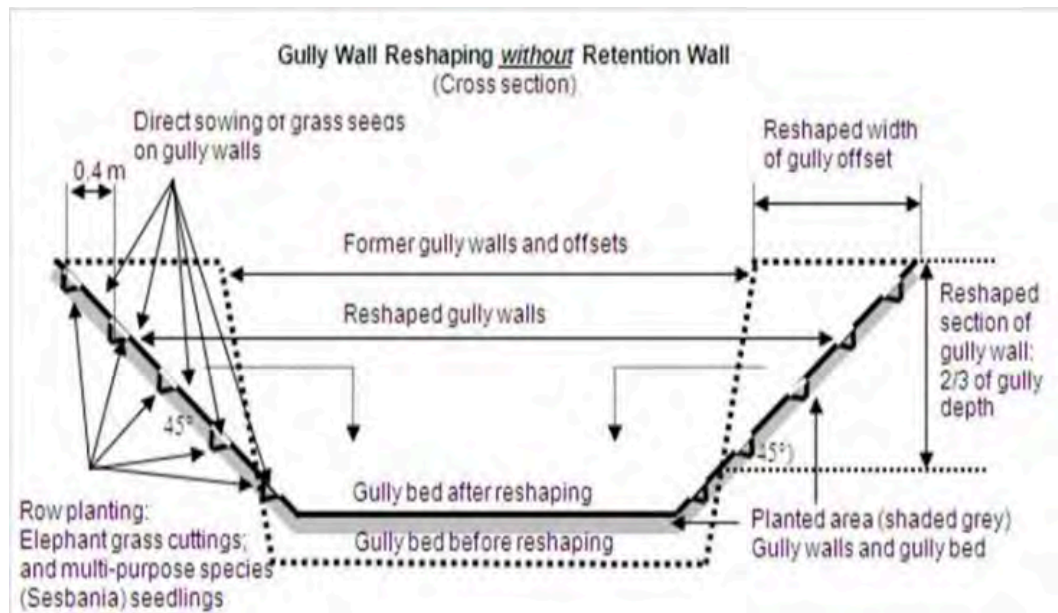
Stabilized gully with side walls cut and filled at 45 degrees
